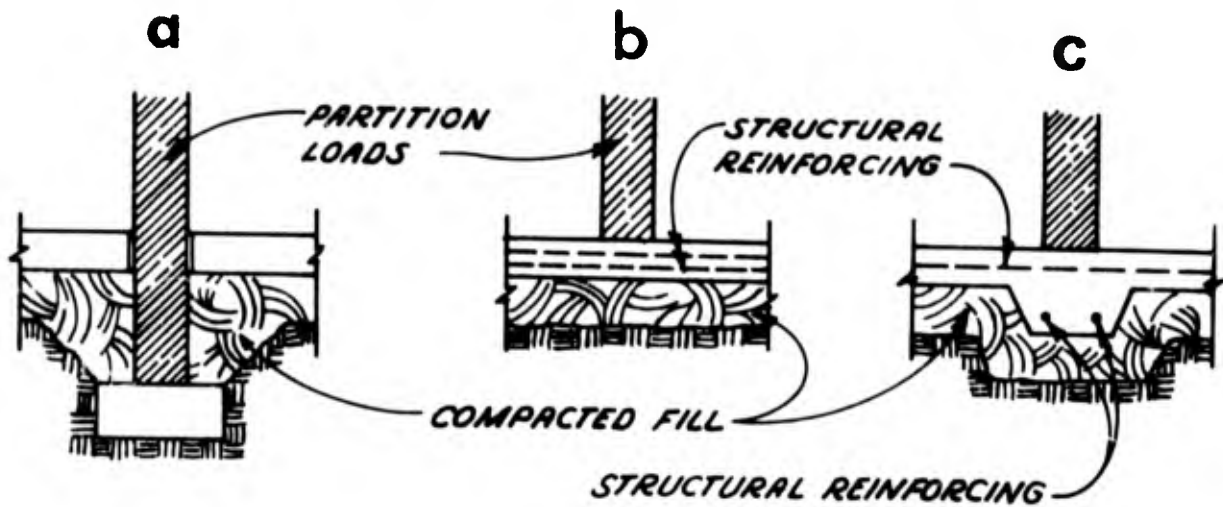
(cont'd). Footing details for Type I and II slabs for heavy partitions loads "a", and alternatives "b" and "c" when the slab has been designed for the partition loads and the amount of steel reinforcing selected on this basis.
